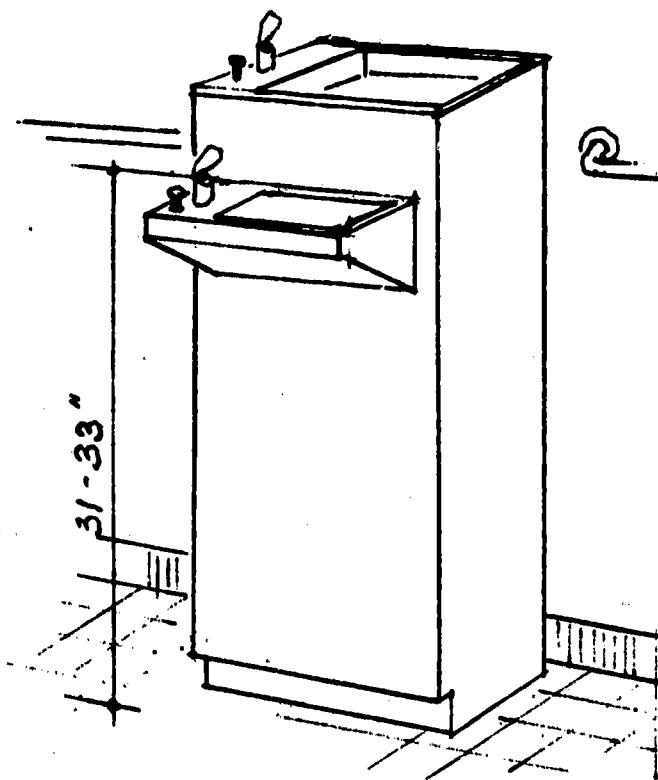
The floor cabinet model is available with an additive basin; while this two-level unit would serve the dual use, it is not recommended because of the hazard created to persons with poor vision and to blind persons who will be using the wall handrail.
